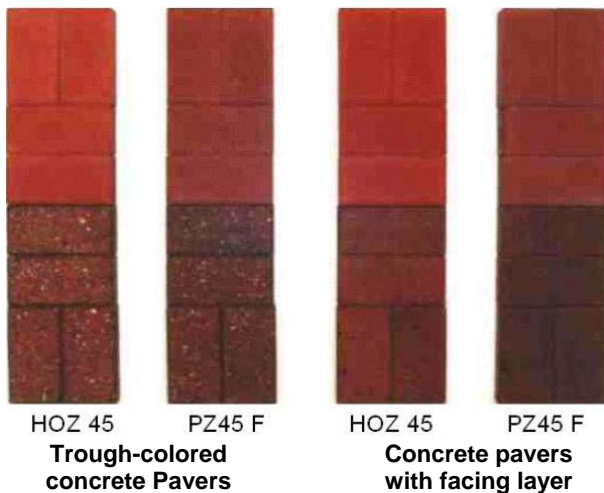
Concrete pavers produced using different cements, colored with 5 % Bayferrox® 130
